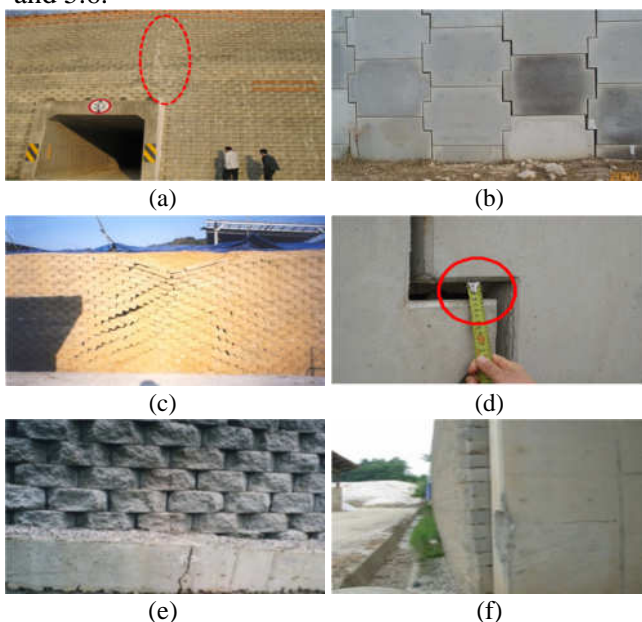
Excessive settlement and deformation of REW((a) cracking of facing wall, (b) differential settlement of facing wall, (c) settlement of REW, (d) excessive settlement of facing wall, (e) differential settlement of REW, (f) deformation of wall)(Lee & Cho, 2011)
